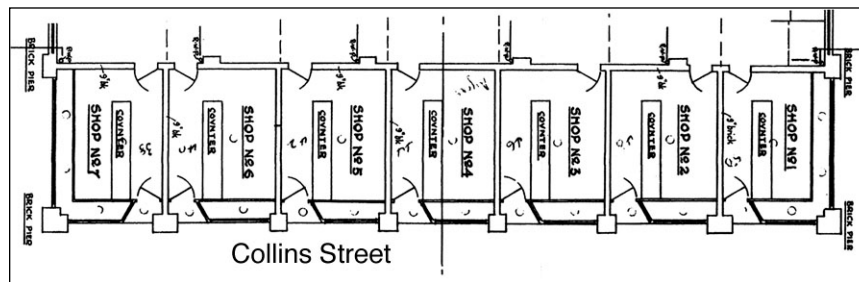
1914 layout of Collins St shops. Note that the shops are numbered in reverse order to the 1968 plan below (HCC Drawing A7²).
